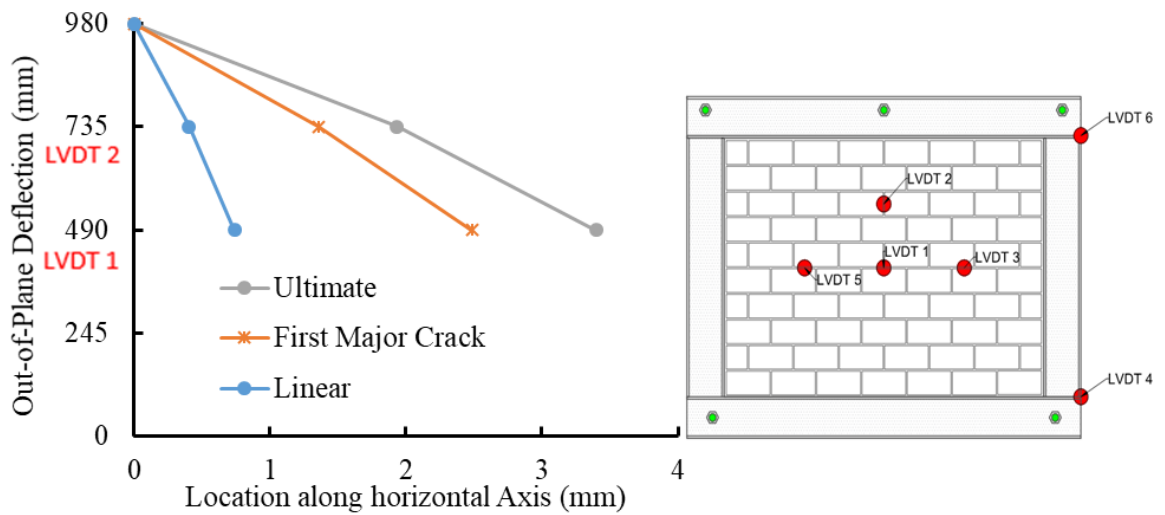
Out-of-plane failure mode for specimen IF-S-CC
